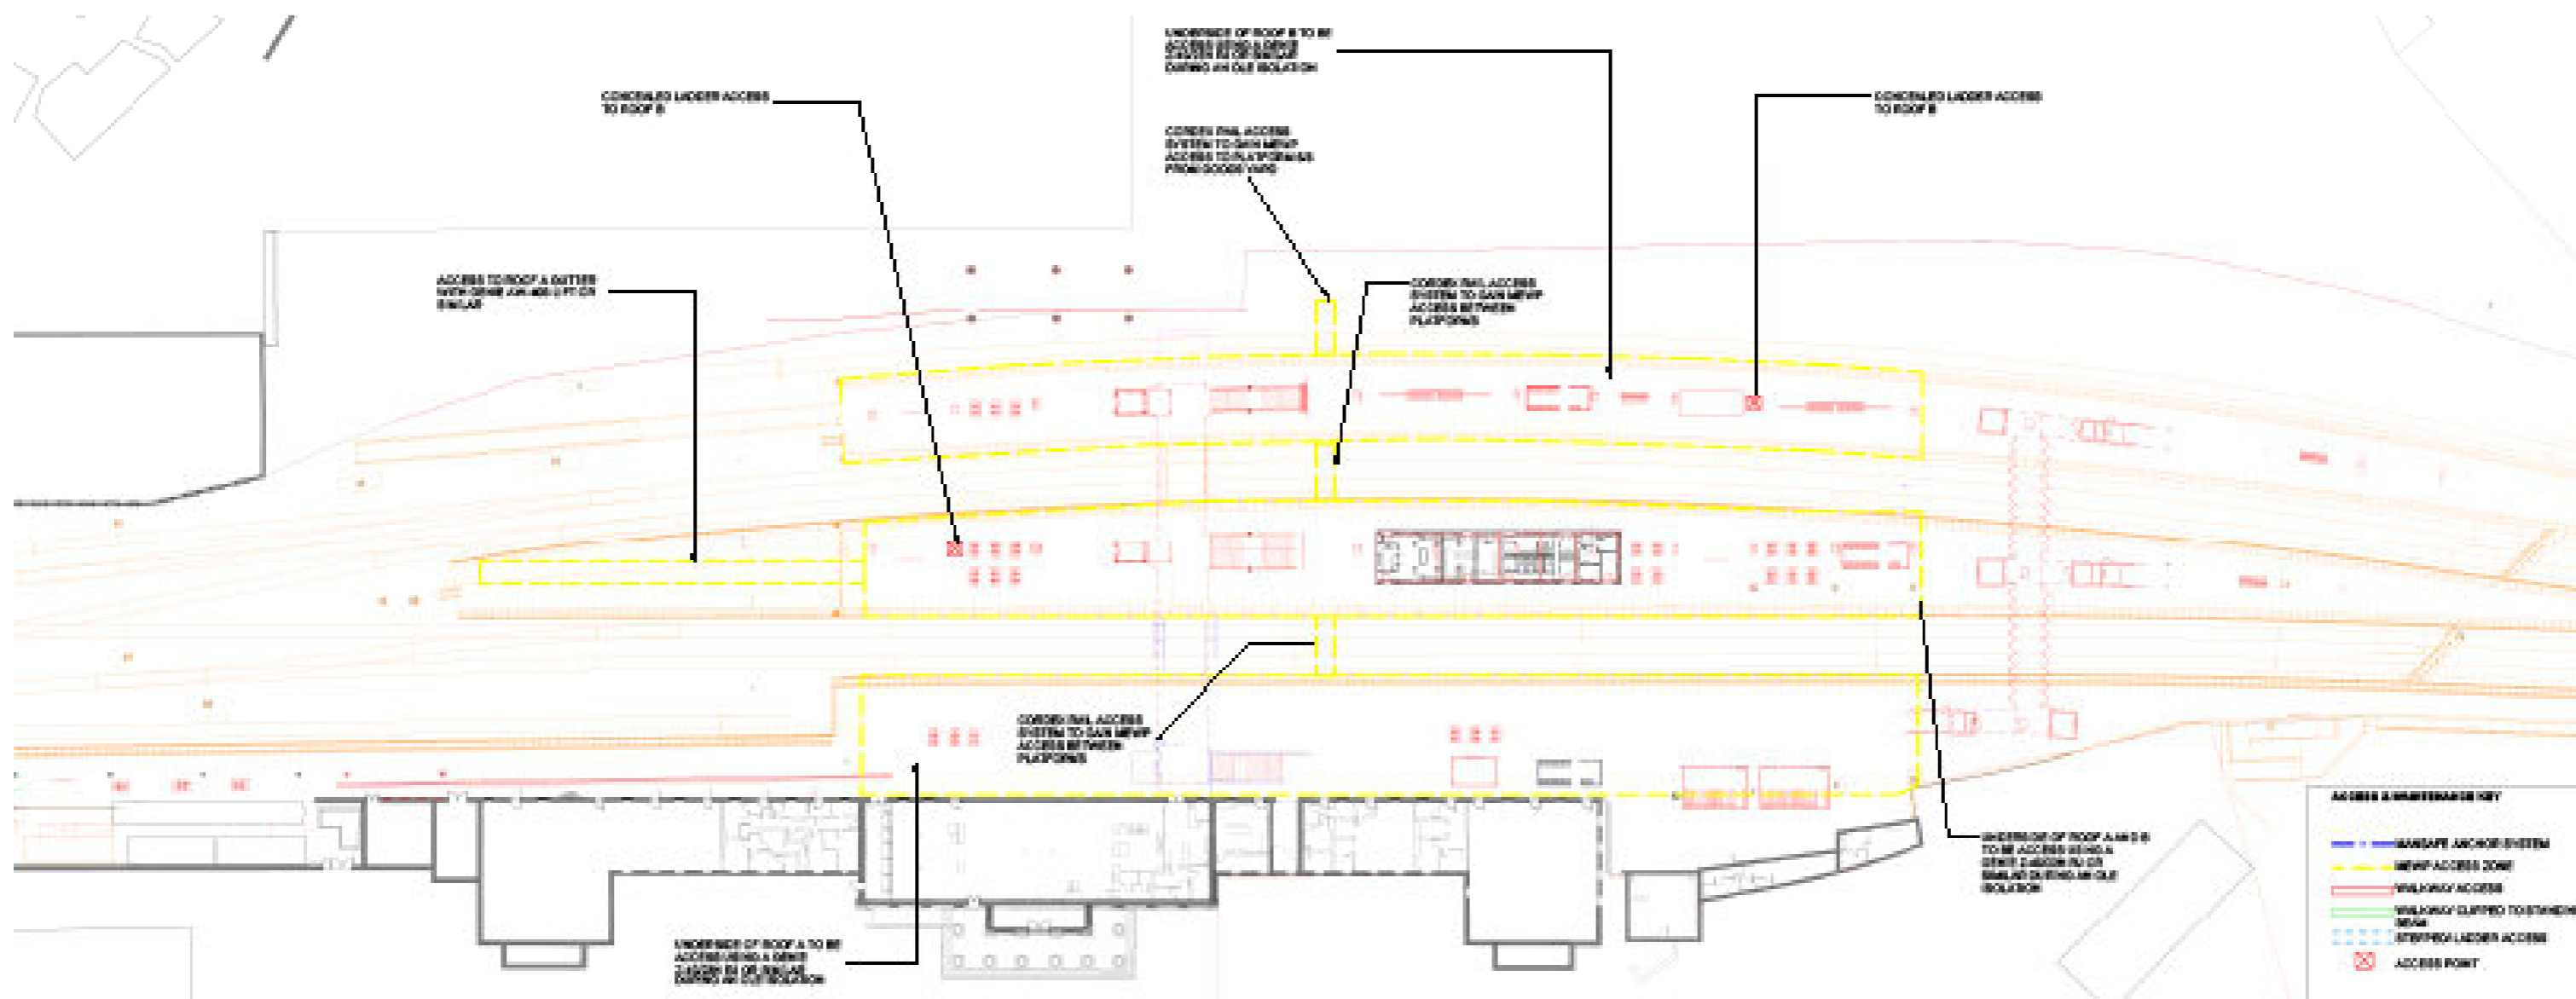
Proposed Platform Access and Maintenance Plan
